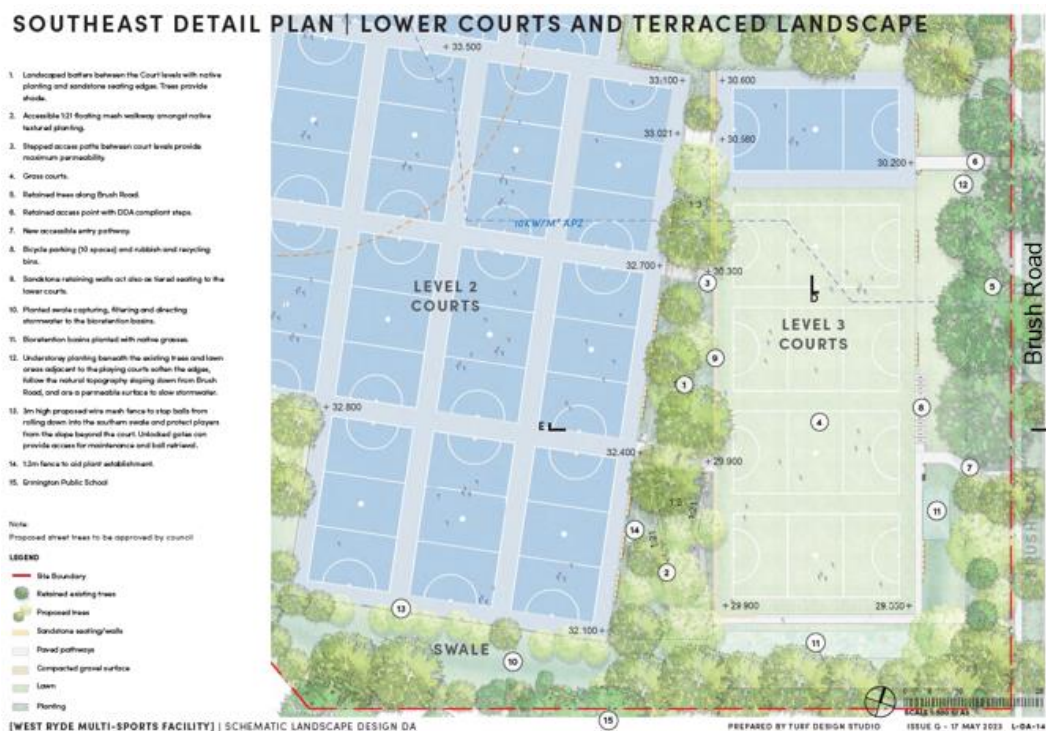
Extract from the Schematic Landscape Design Plan showing the grass courts and planting along the eastern side of the site, both within the site and new street trees.
